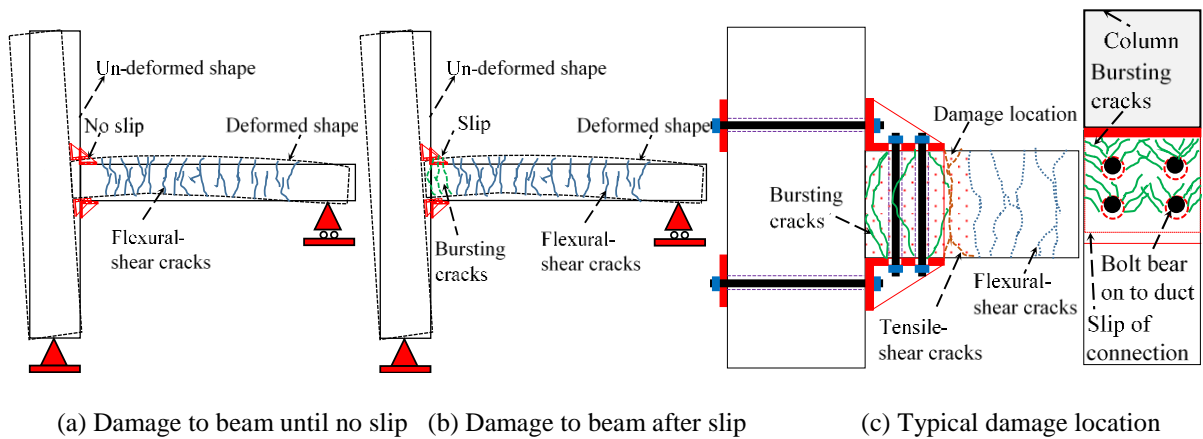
Schematic layout of deformed shape of the sub-assembly and crack patterns in the beam
